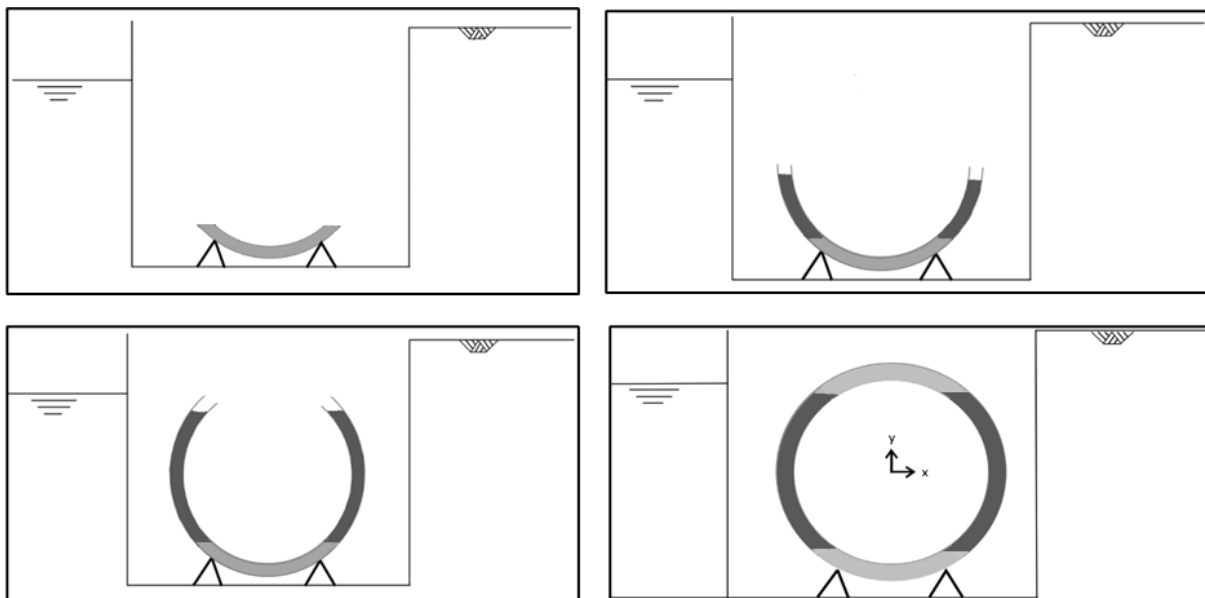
Construction sequence of the spheres with construction in a dry dock. The bottom and top element are prefab (light grey).
